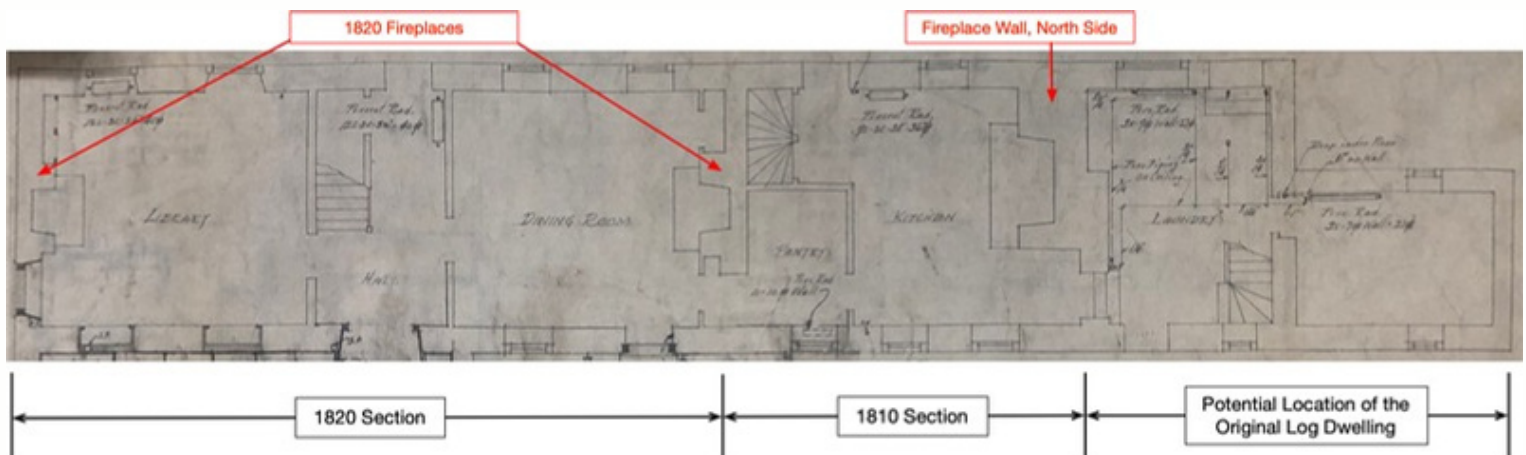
Floor plan of the house showing the dated sections and the potential location of the log dwelling. Note that the orientation is the same as the photo in figure 10, but that the portion of the house where the log dwelling may have been located had been modified in 1918, before these floor plans were drawn by Richardson Brognard Okie in 1932. Thus what is shown in these plans for that eastern section don't match what is shown in the photograph. Pennsylvania State Archives.
